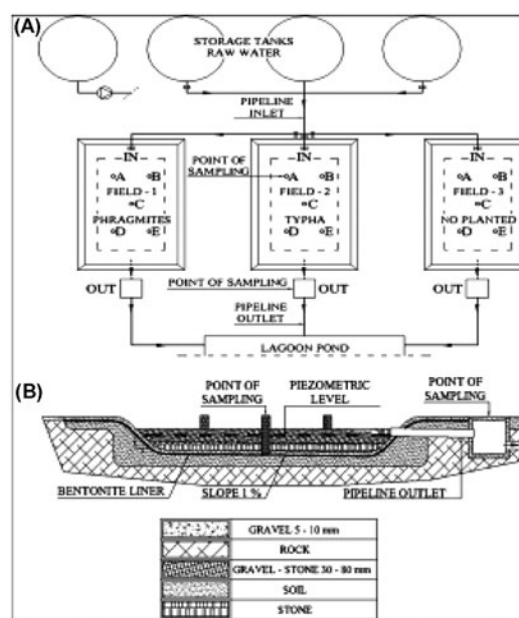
Constructed wetlands pilot plant at Lecce, Italy: (A) plan view and (B) longitudinal section.
